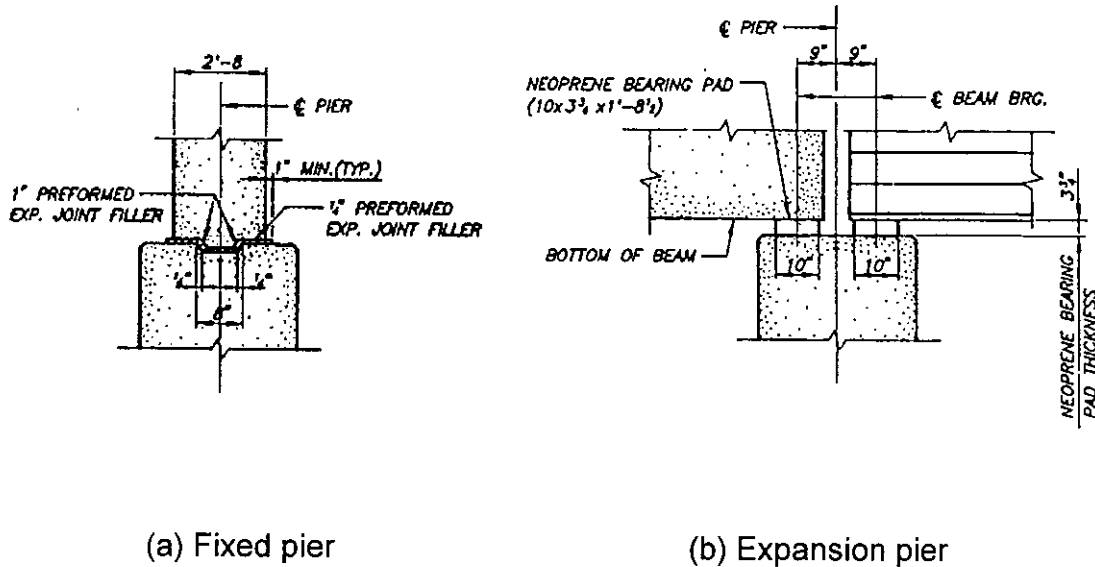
Typical pier/pier diaphragm connection details [35]
